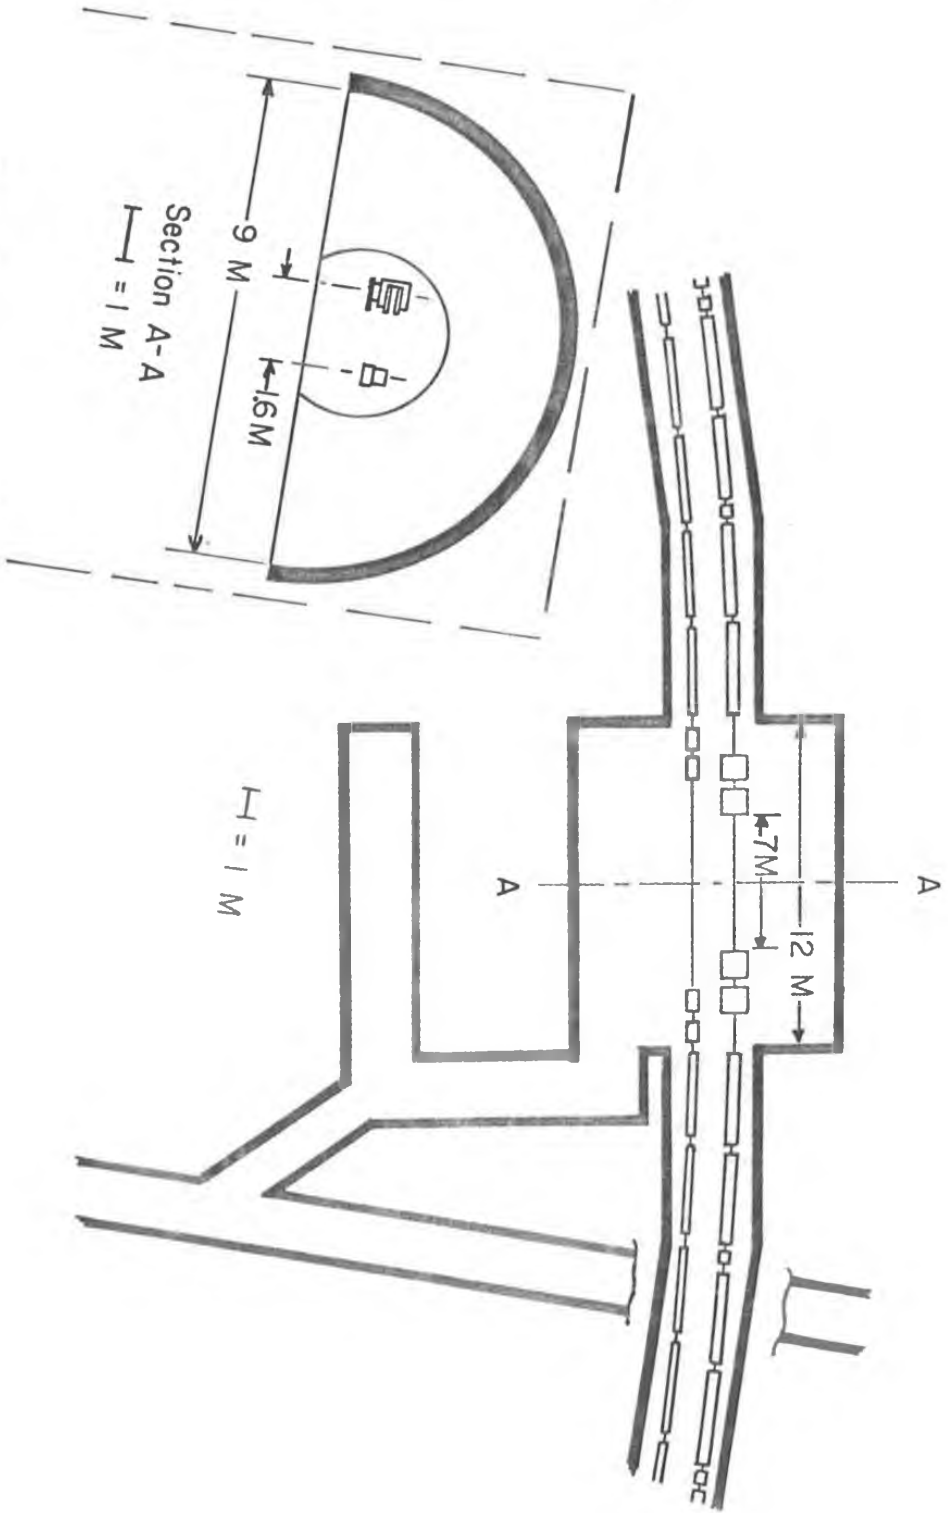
Schematic plan and elevation view of intersection area in the north room.
